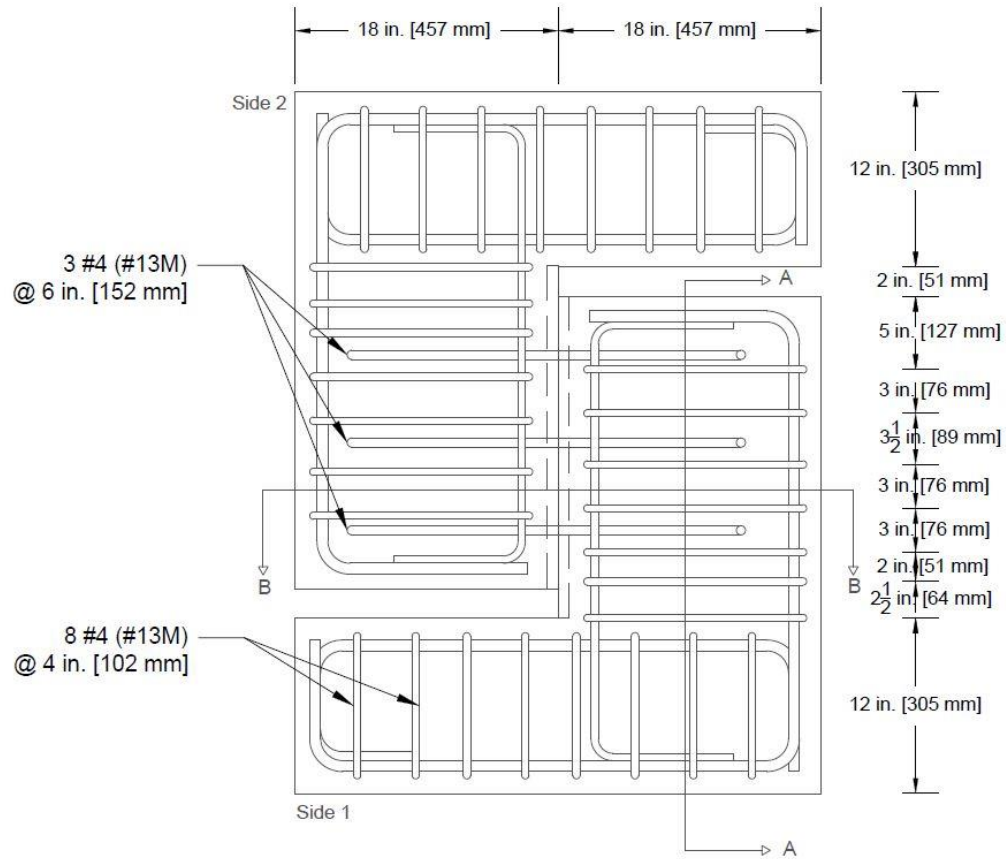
Steel layout for a specimen containing three #4 U-bars spaced at 6 in. (152 mm).
